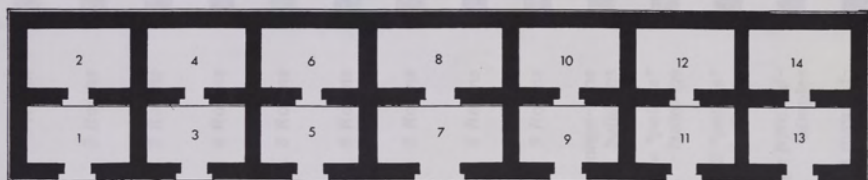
LARGE RANGE-TYPE BUILDING (Uxmal, West Building, Nunnery Quadrangle)
